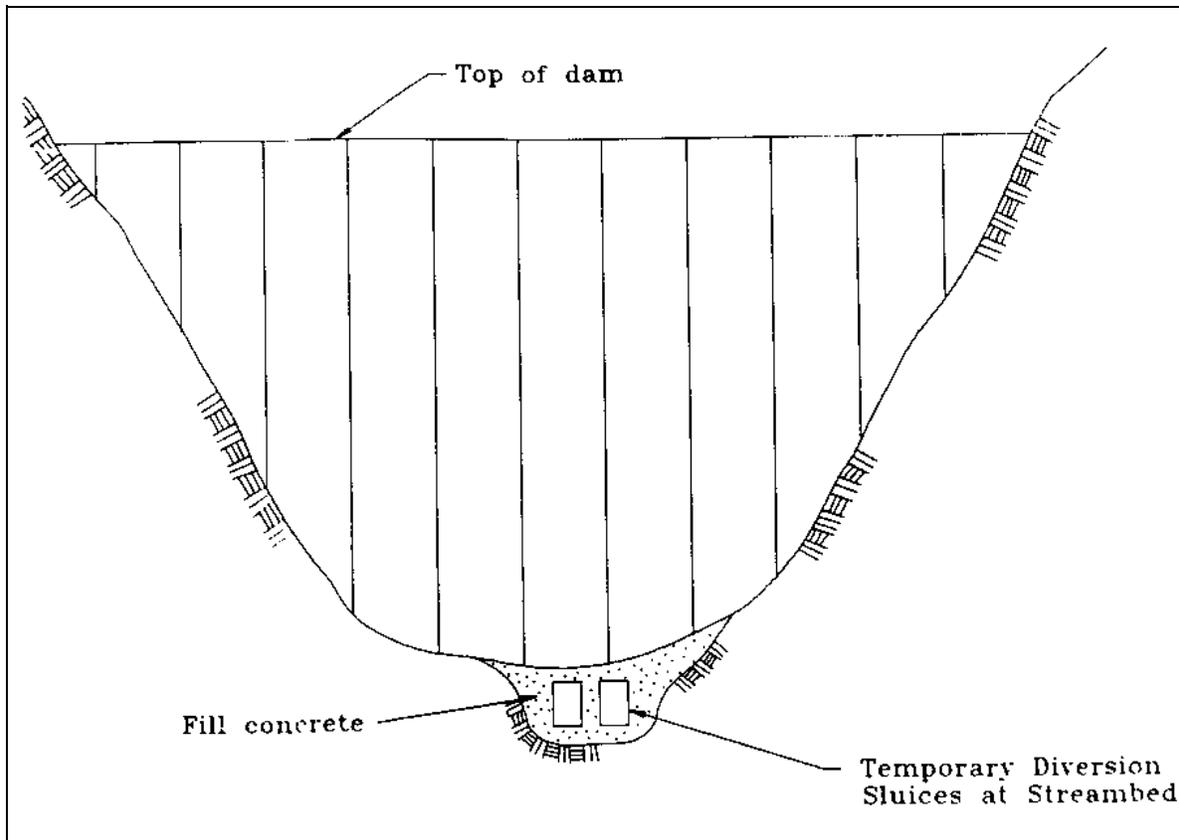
Diversion sluices through concrete pad at the base of a dam
